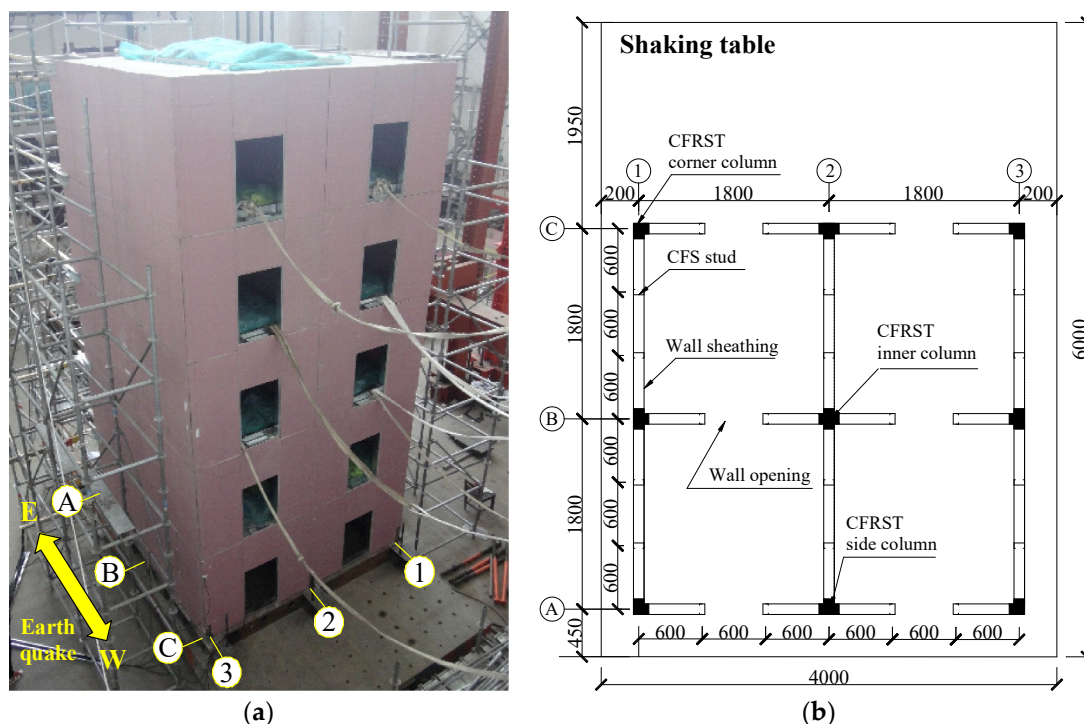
Layout and dimension of the test model. (a) Three-dimensional (3D) view; (b) Plan view.
